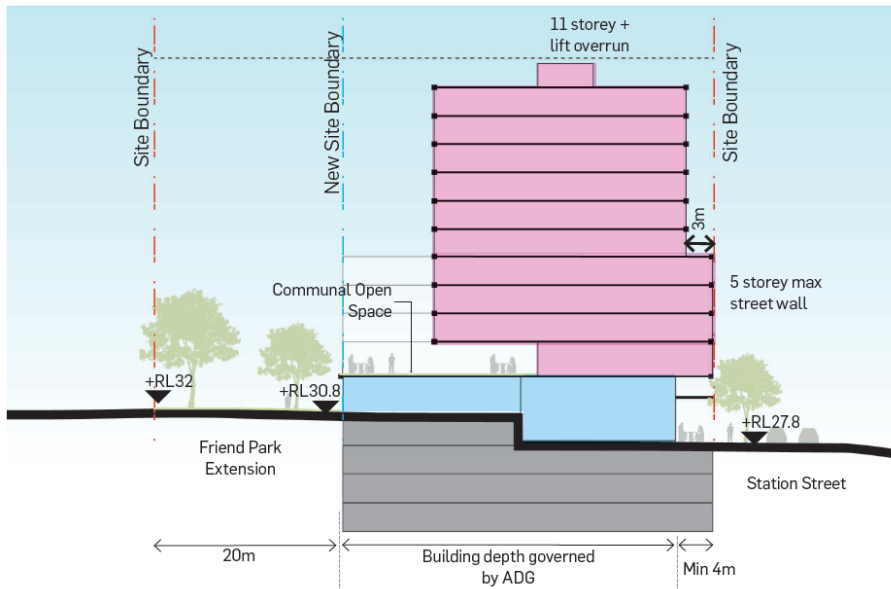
Section A-A through corner of Pritchard Street and Station Street Precinct (typical east-west podium section)
